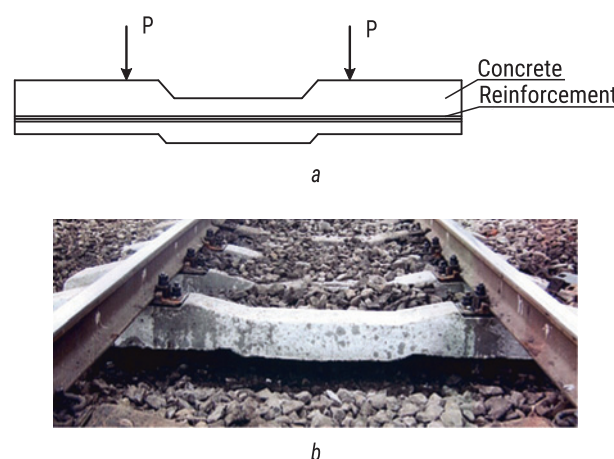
Proposed reinforced concrete sleeper: *a* – diagram of changing the location of concrete mass and pre-stressed reinforcement; *b* – view of a sleeper laid in the track
